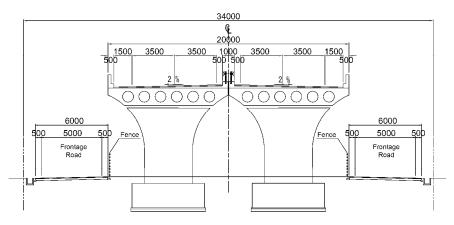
Typical Cross Section of Viaduct (Approach Road)
